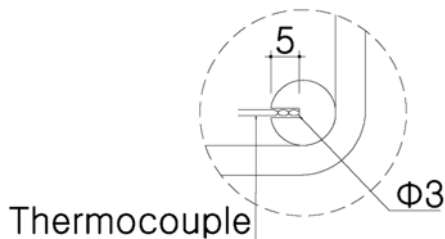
Details of thermocouples installation for steel rebar (mm)
